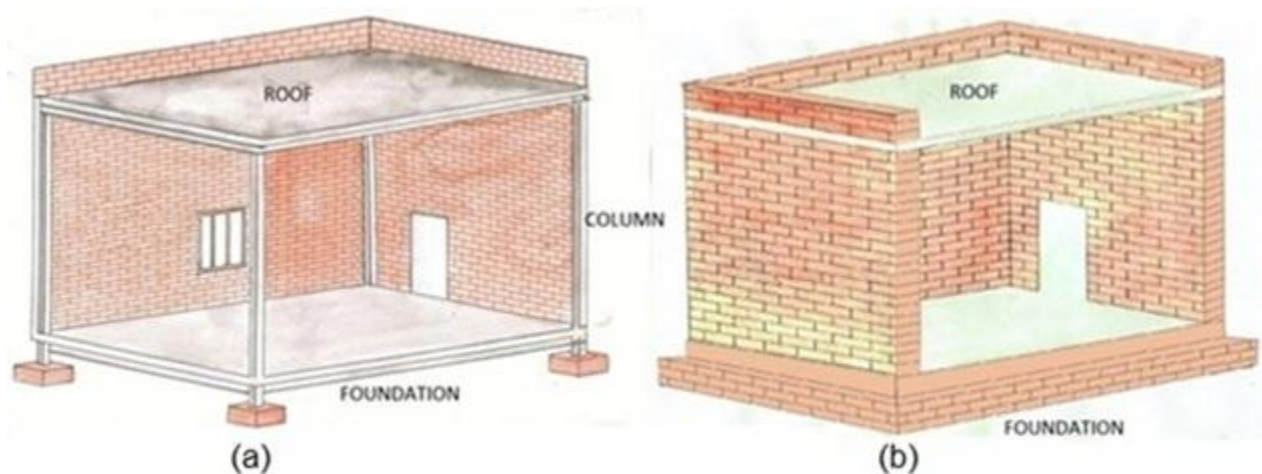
Structural Elements in (a) RCC and (b) load bearing buildings
